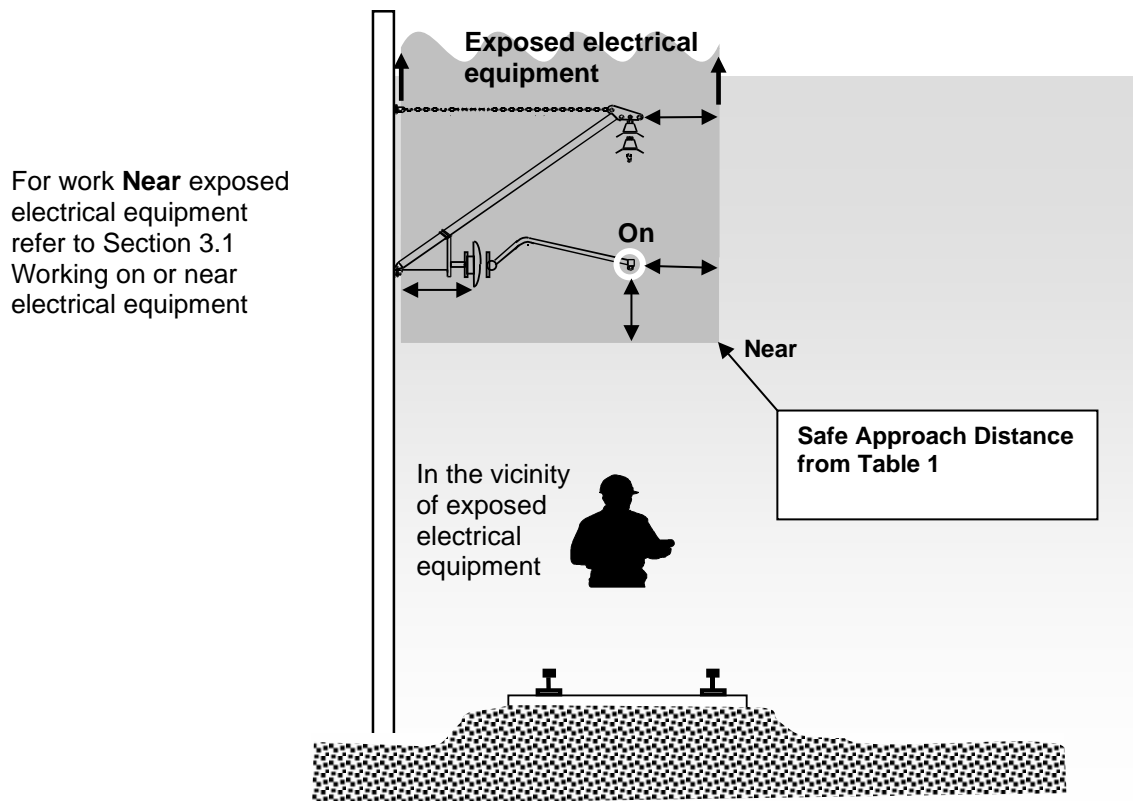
Working around exposed electrical equipment (looking along the tracks)
